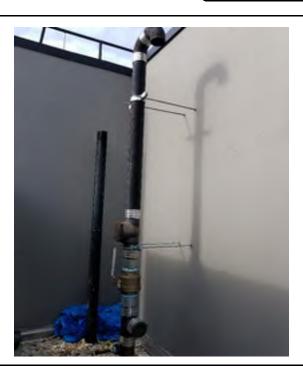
V6 riser and sample port in good condition, facing northwest. 27 February 2019.
